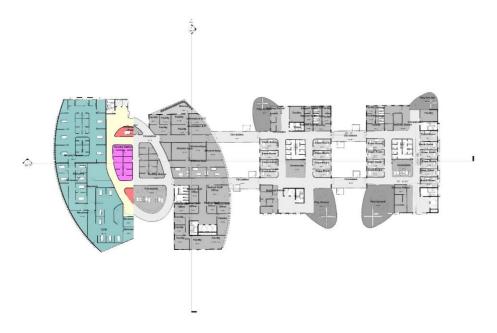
Surgery Zone's Floor plan (Image credit by author)
